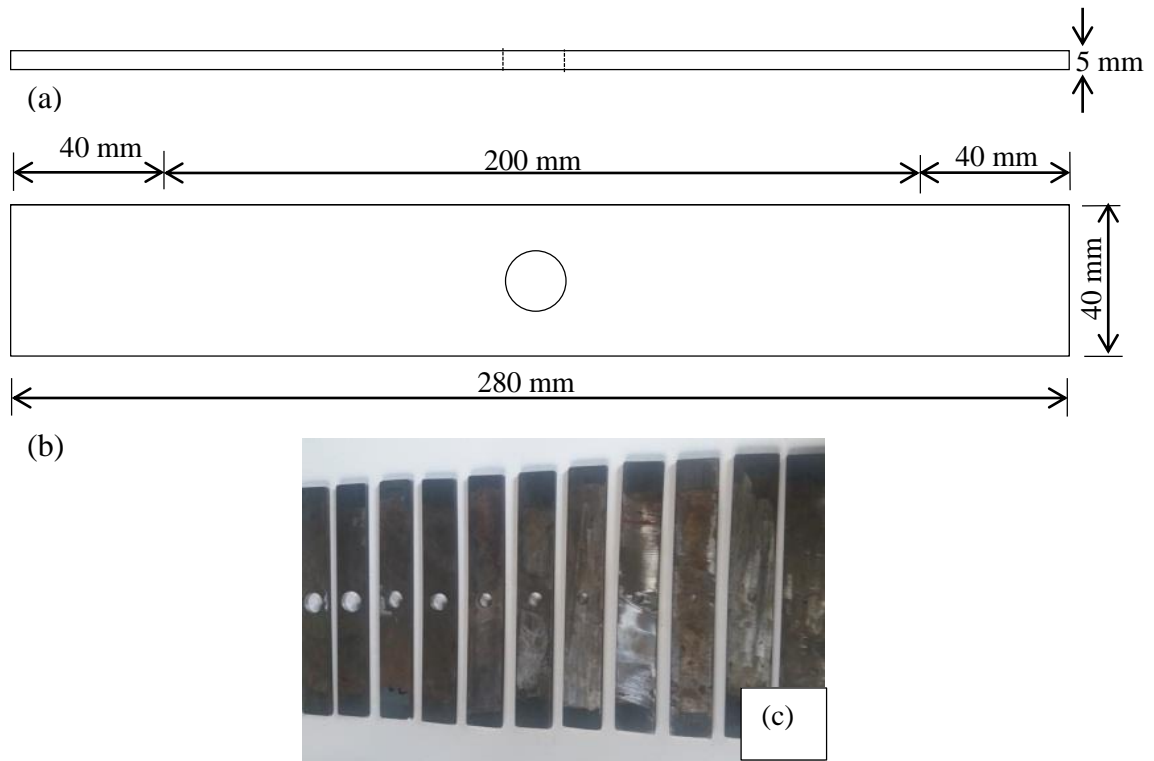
Schematic view of the non-conditioned and non-strengthened specimen (Scale 1:2) (a) elevation (b) plane view (c) typical specimen
